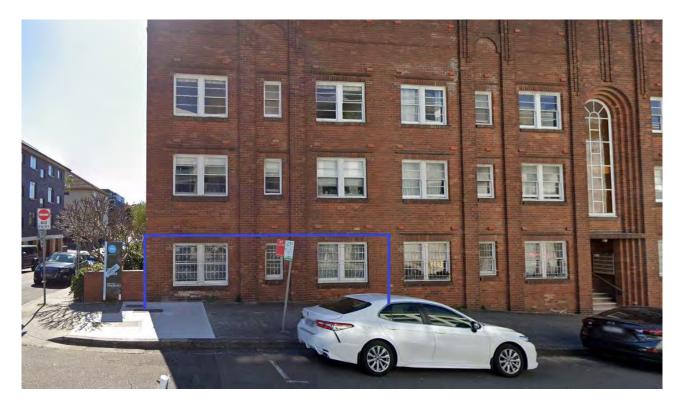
Annotated Beach Road view of subterranean Unit 30, proposed one bedroom apartment (Source: Google Streetview 2025)
